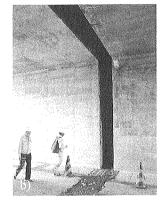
Opening of a joint of culvert box and damage to an adjacent embankment along JH Kan-etsu Expressway (site 6 in Figure 1)
